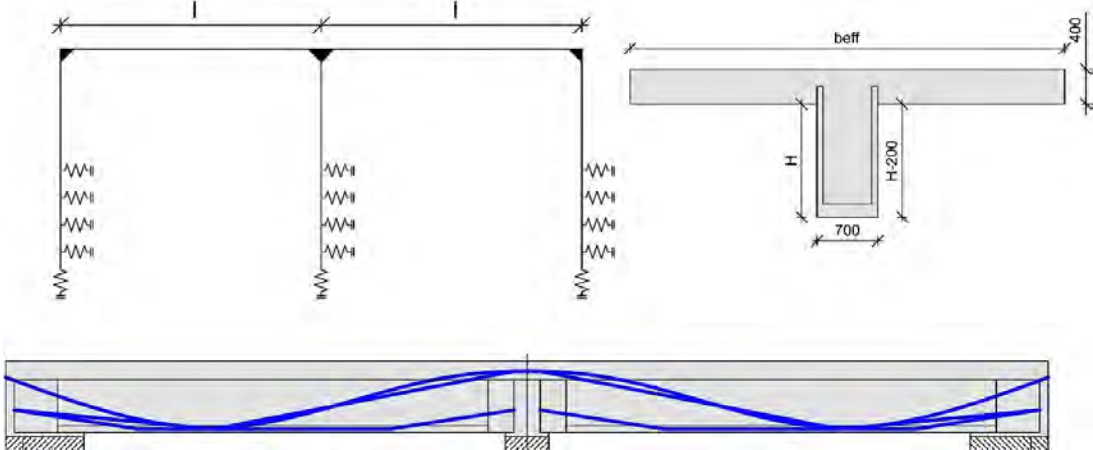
Static system, cross-section and post-tensioning of construction phase 4
